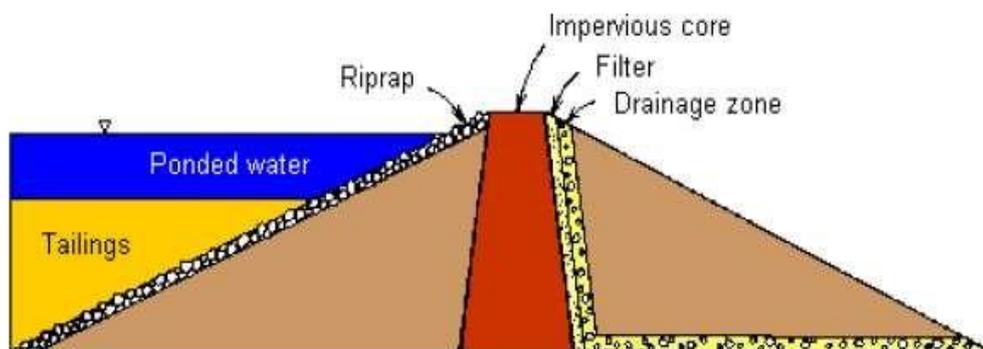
Dam construction as a traditional embankment dam. (Steven G Vick)
